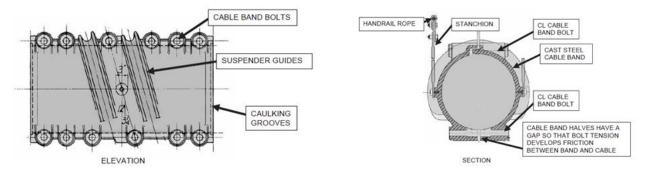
Cable Band Schematic. Elevation (left) and Section (right) Views.
